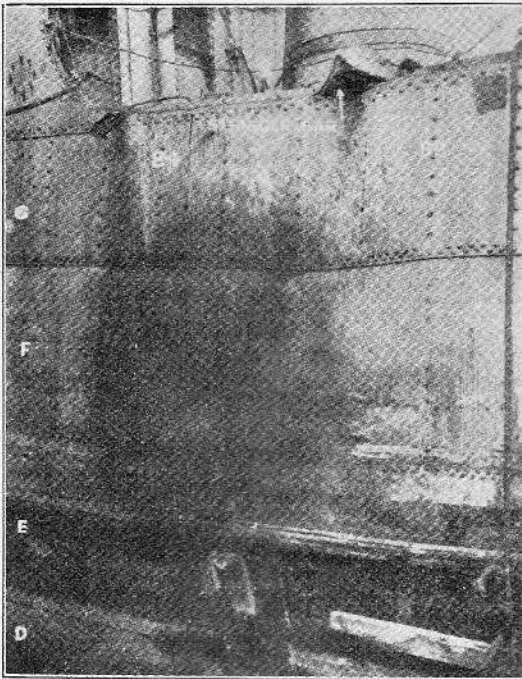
Sagging Test. Details of Buckling in Port Side, Frames 84-88, showing Character of Failure of Stringer Bar, and Sharp Buckle in Strake E of Hull Plating approximately at Neutral Axis.
